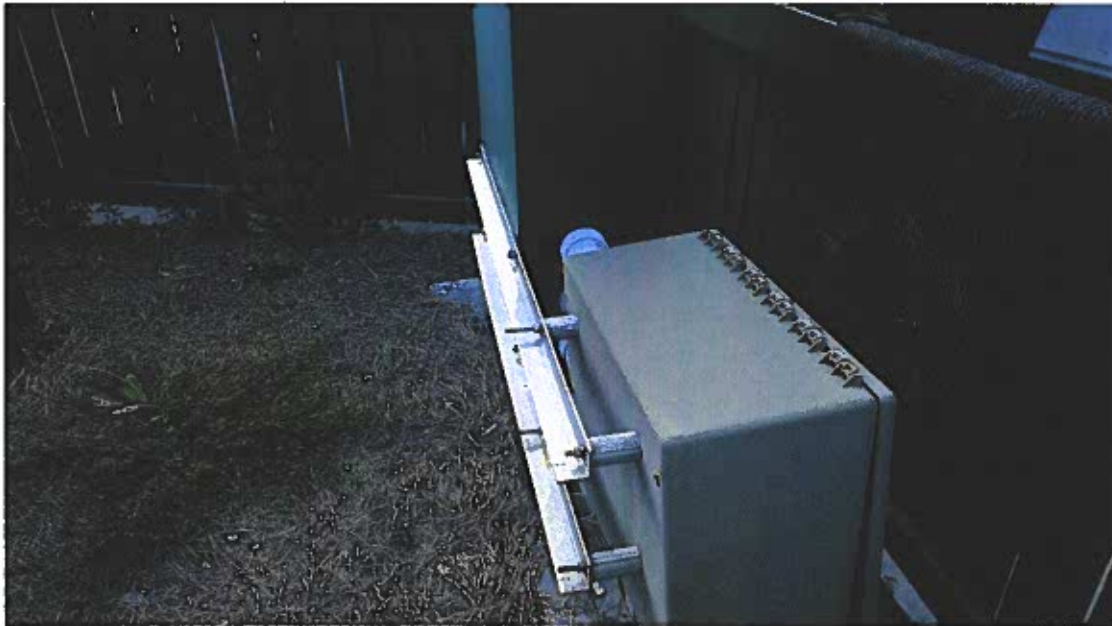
Flexible conduit is burdened with shells and pulled free.
